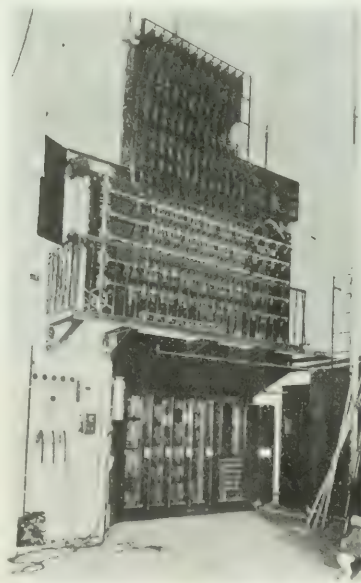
THEATER SWITCHBOARD, PANEL BOARD AND DIMMERS
